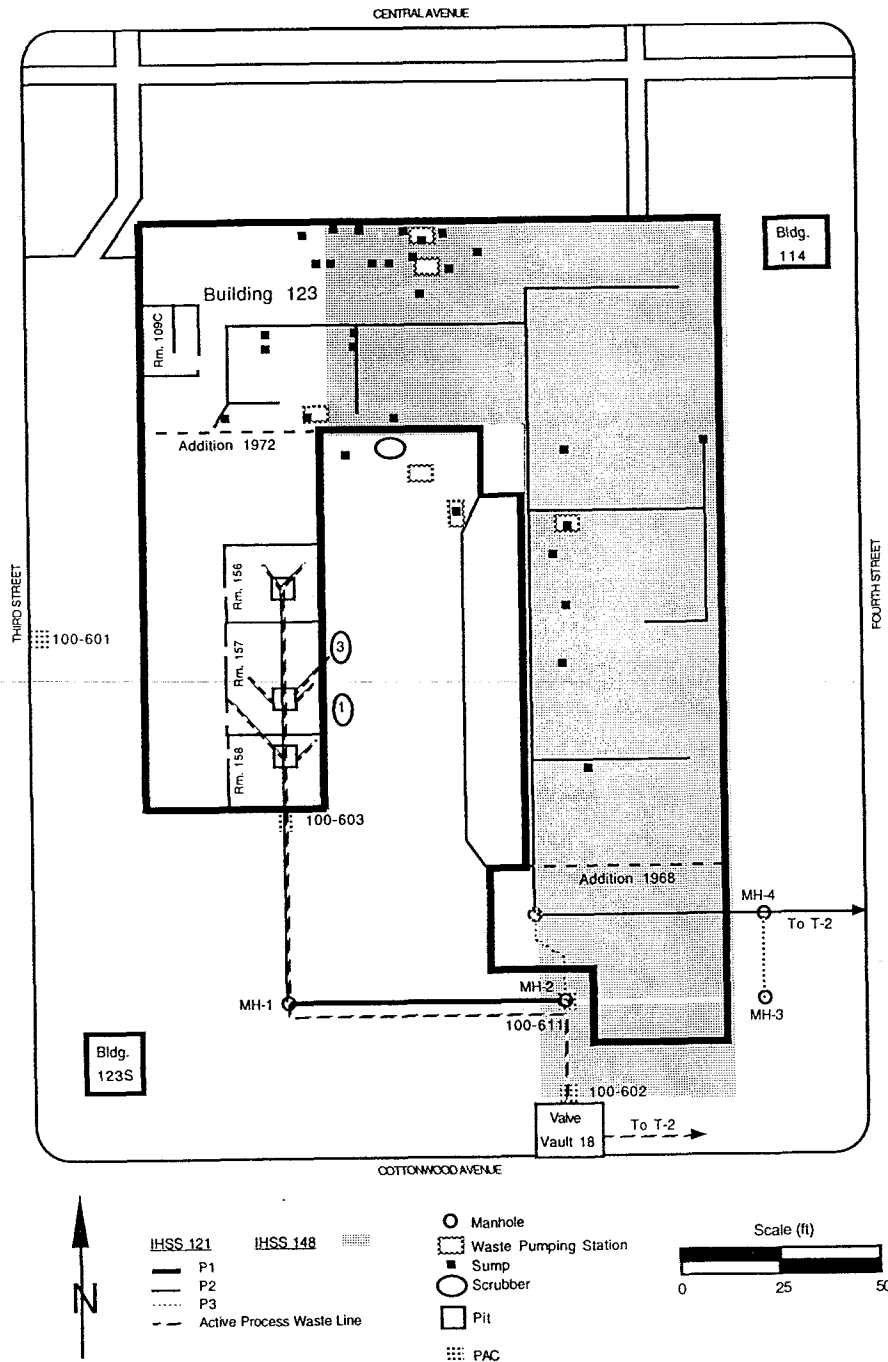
Location of Building 123 and Associated IHSSs 121 and 148
